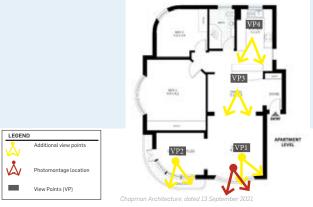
200 Kurraba Road | Unit 1 floorplate and view place
